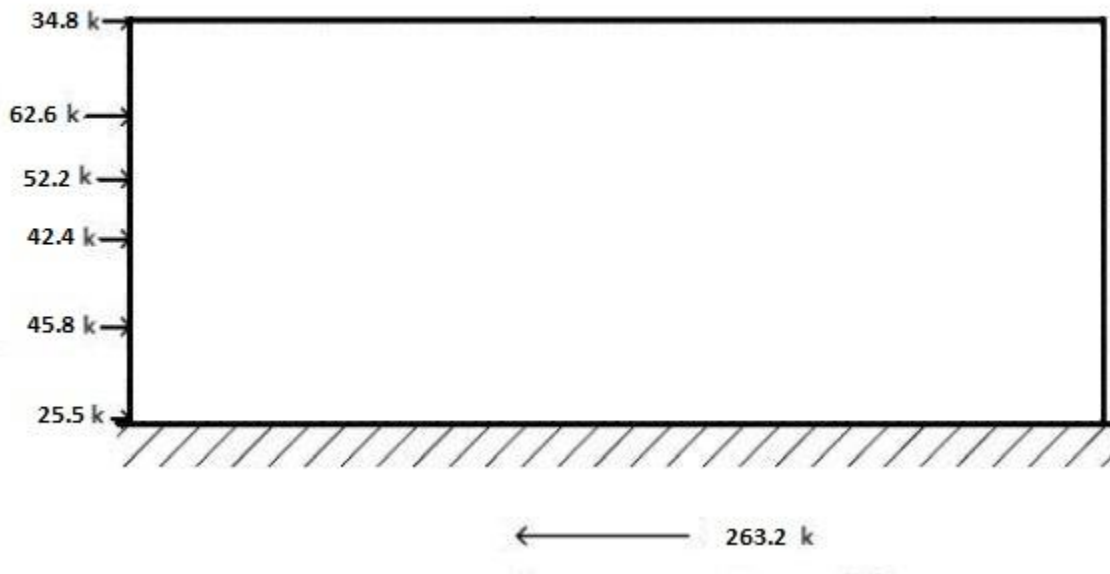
Wind Forces acting at each floor level on the West Wing, East and West facades
